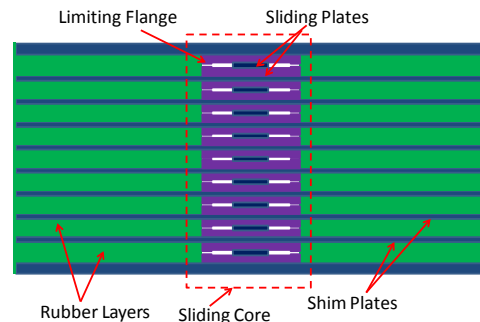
Cross sectional view of the second type of adaptive rubber bearing with three sliding plates having limiting flanges at each layer
